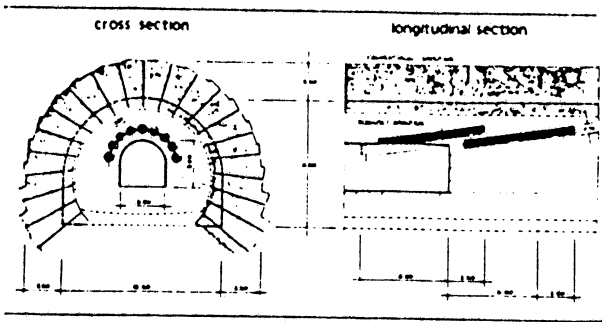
Principle of Tunnel Excavation by Forming Pilot (Protected by Horizontal Jet Grouting), to Allow Treatment (by Permeation Grouting) for Full Bore Excavation, Milano Metro, Line 3.
